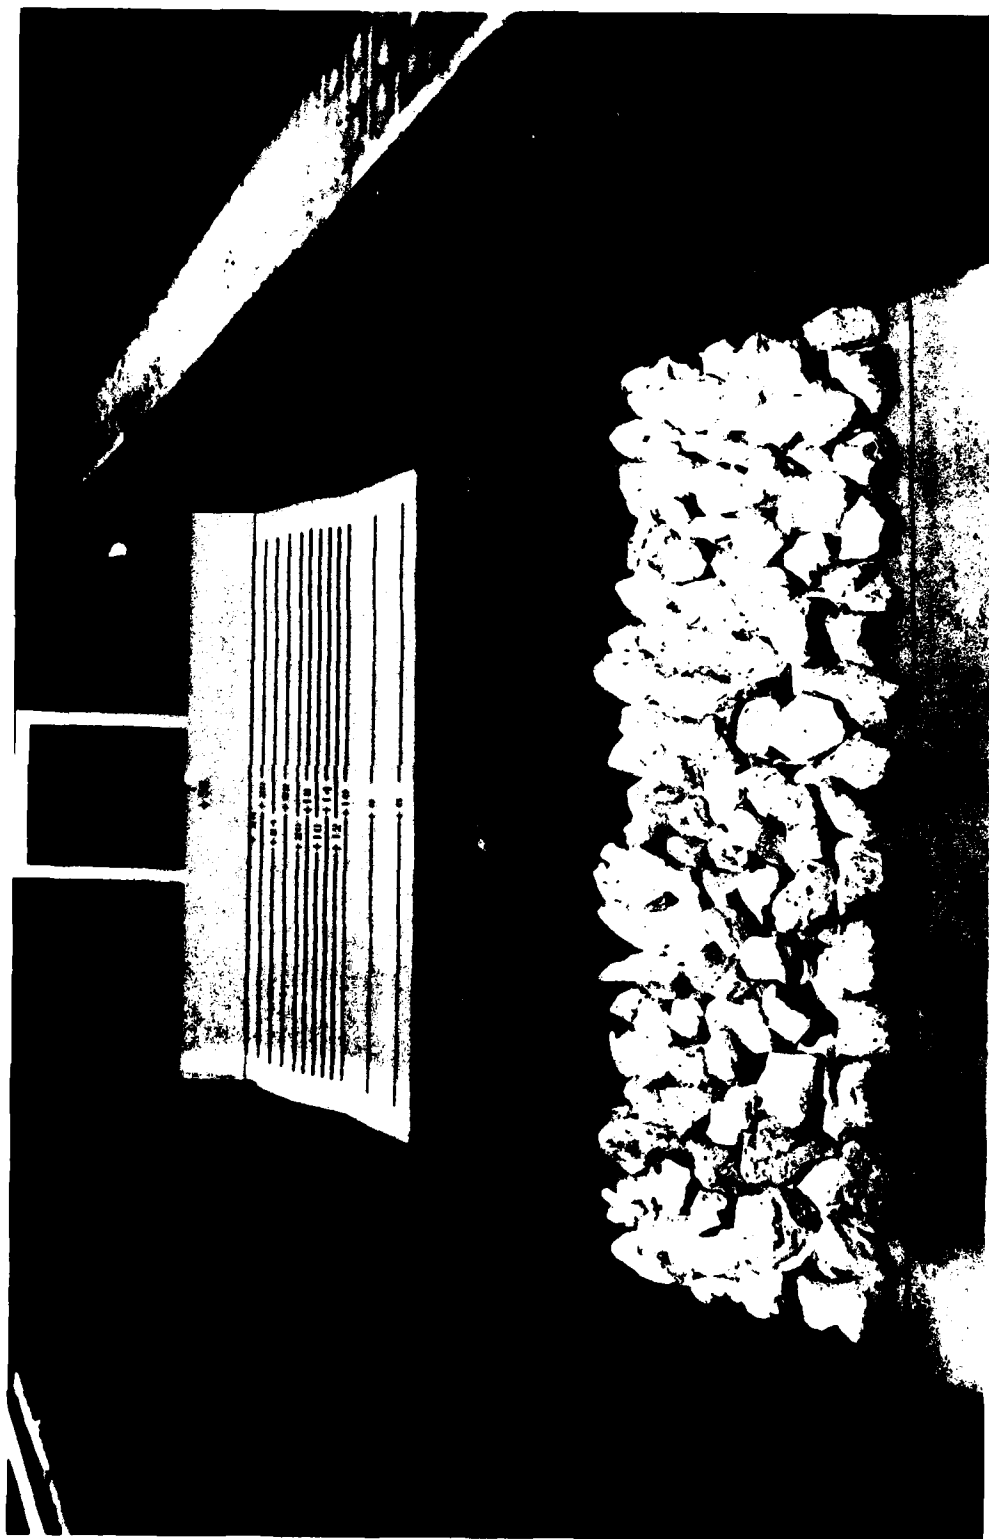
Sea-side view of Plan N-1 after testing Hydrograph A (Plate 1 and Table 1), 1st test section
